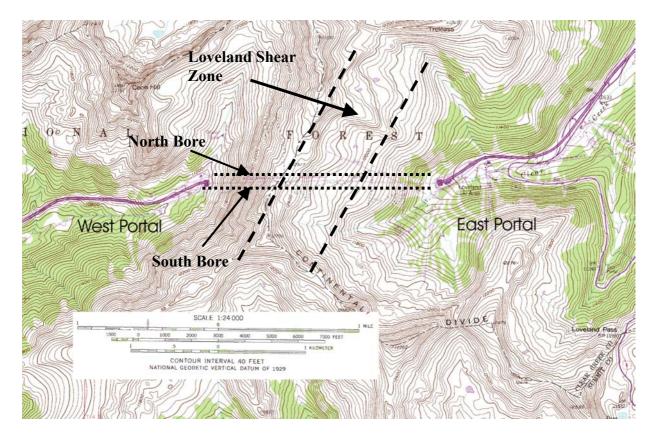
General Layout of the Eisenhower-Johnson Memorial Tunnels
